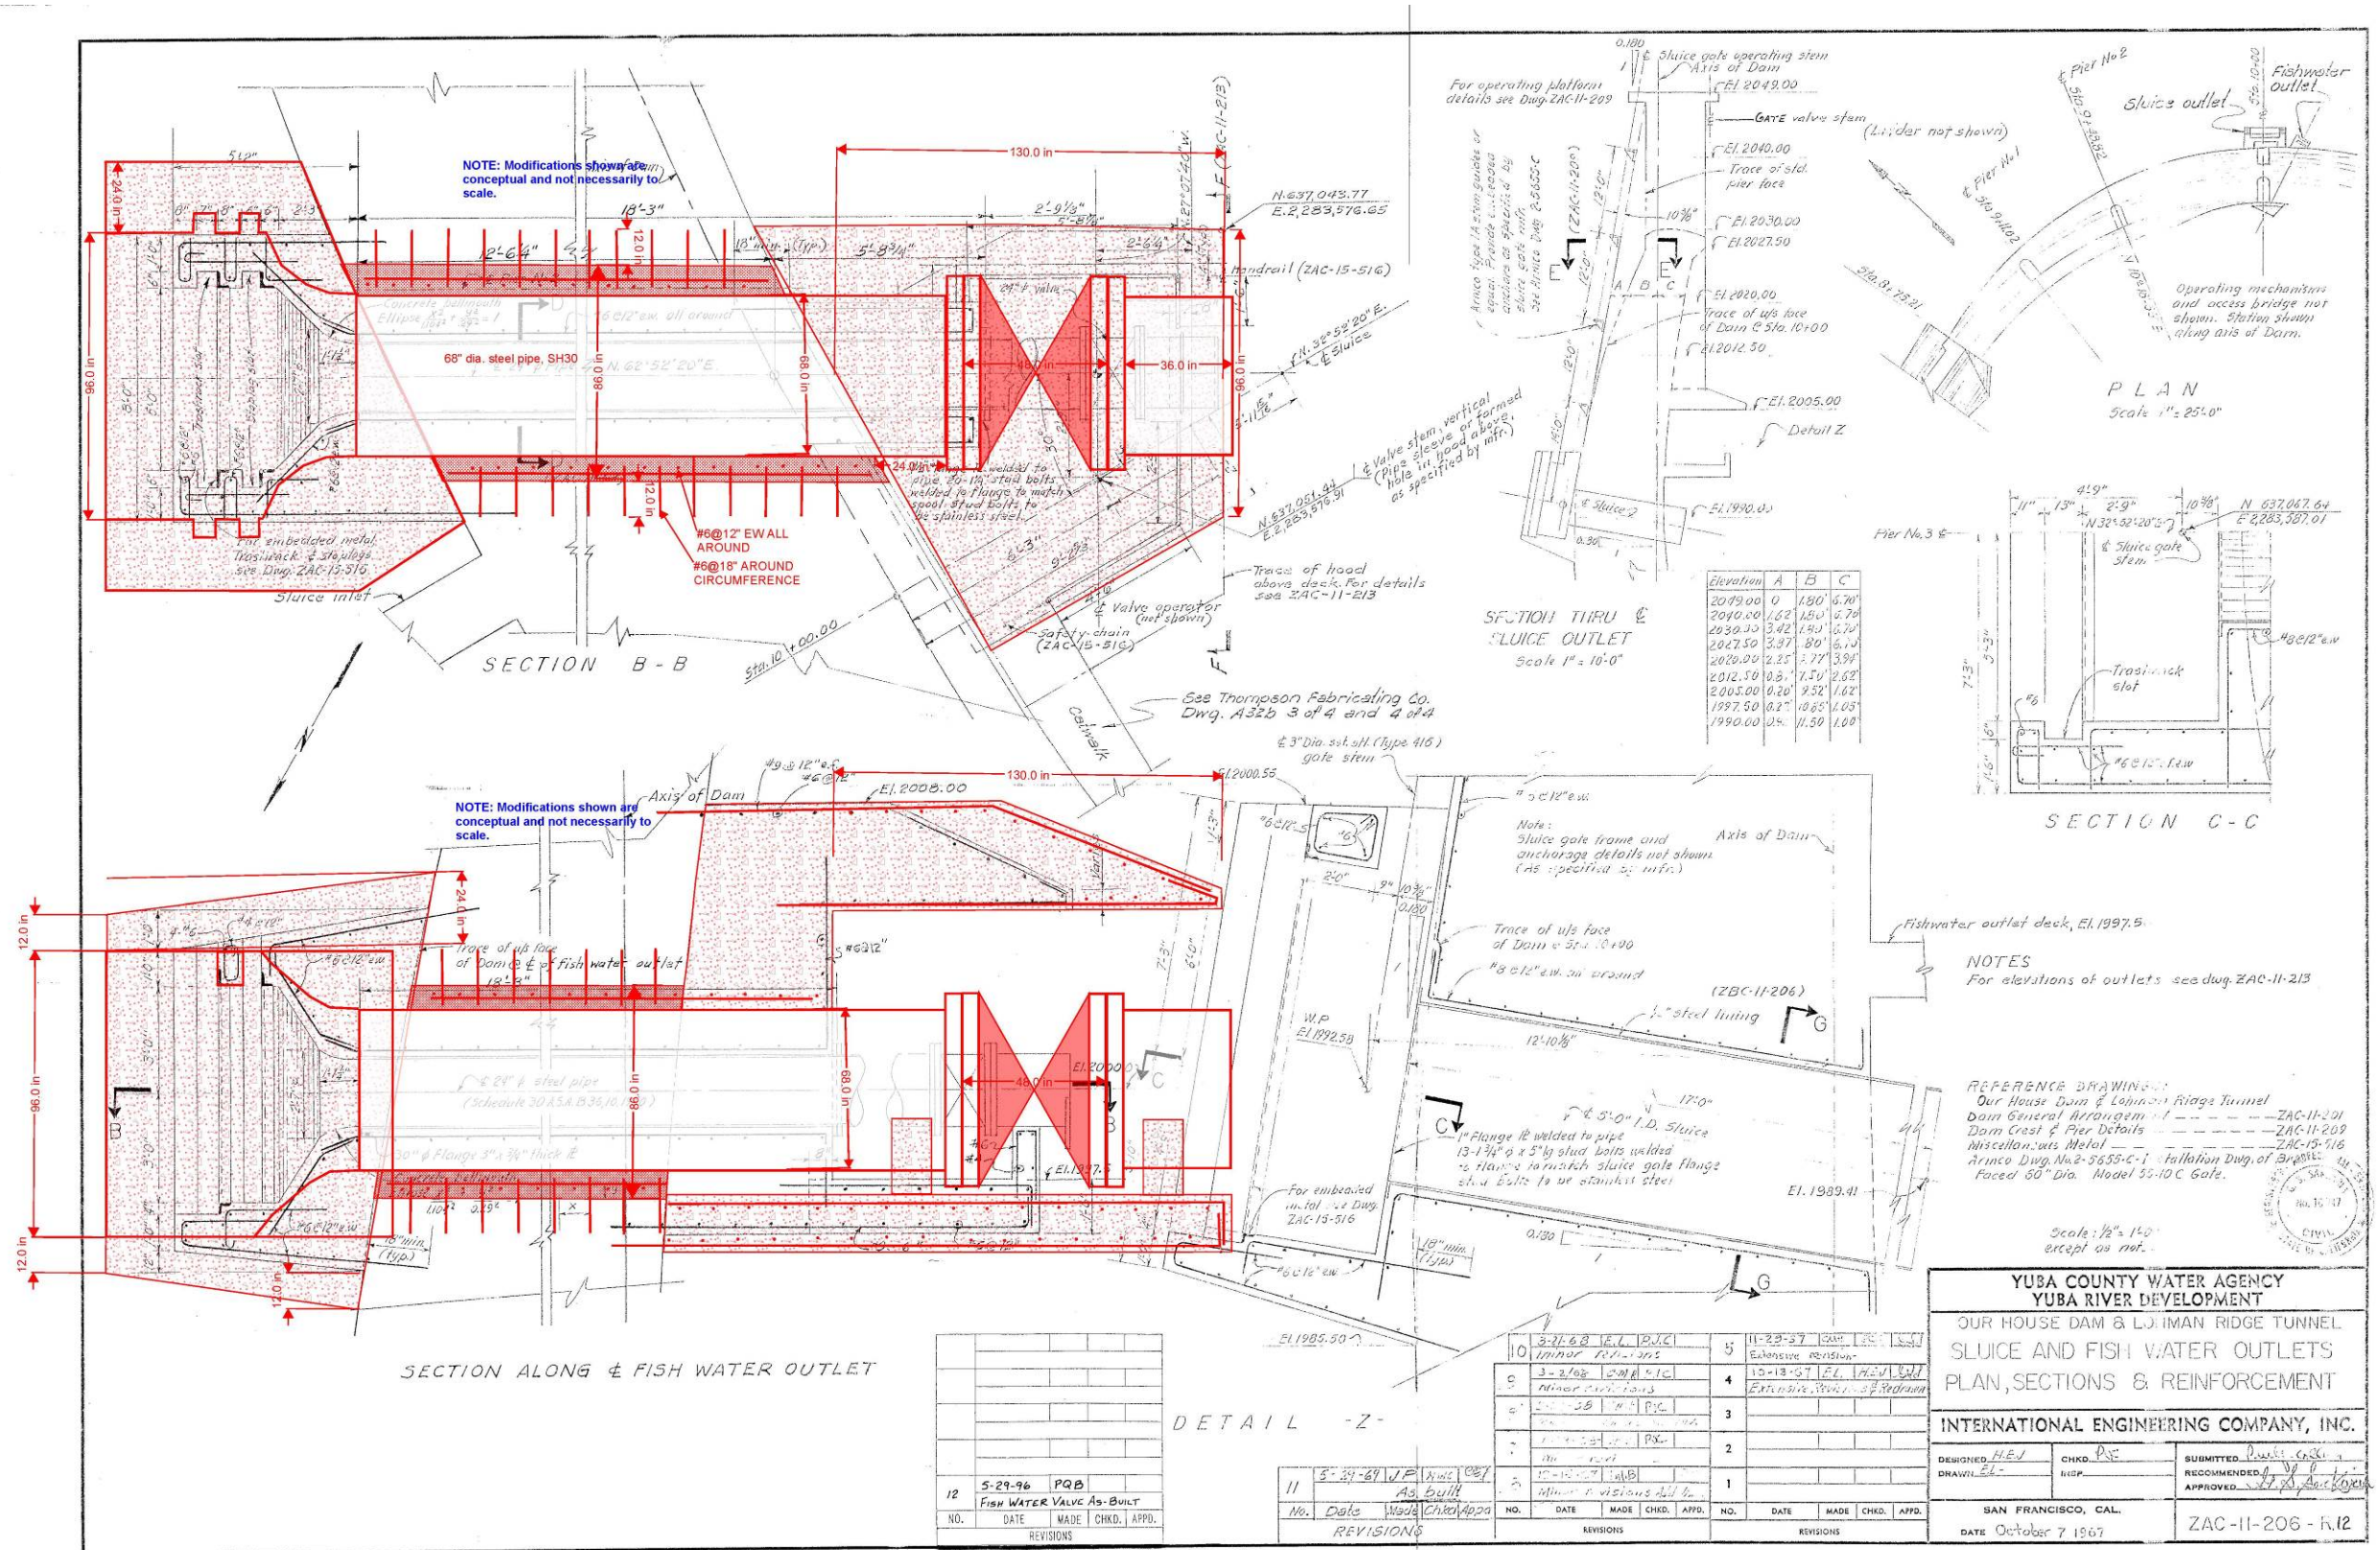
Concept-level profile of YCWA's proposed Our House Diversion Dam Fish Release Outlet.
